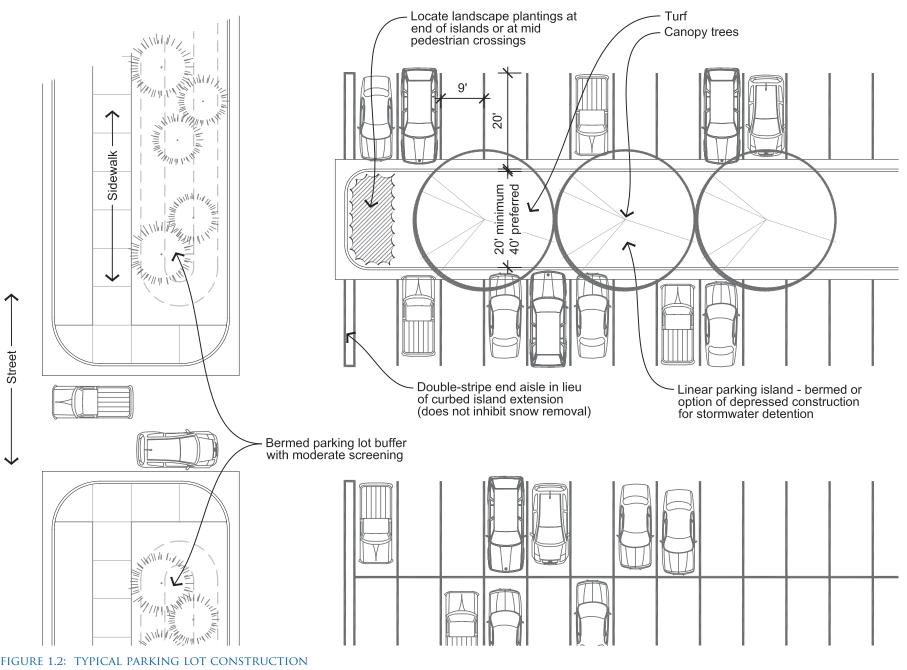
TYPICAL PARKING LOT CONSTRUCTION
